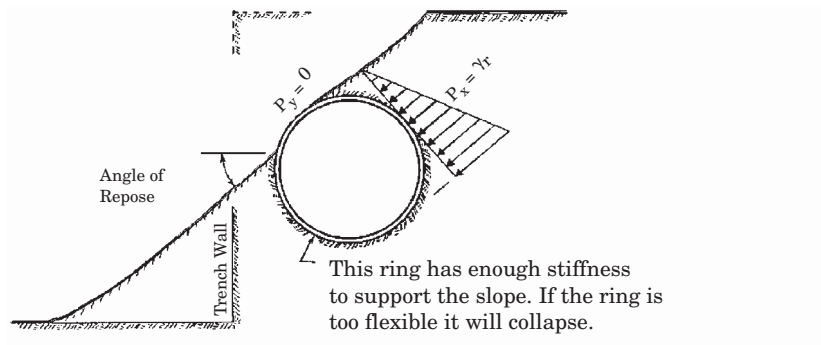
Trench wall sloped at the angle of repose (soil is stable). The flexible pipe requires sufficient pipe stiffness or minimum cover to prevent collapse.
